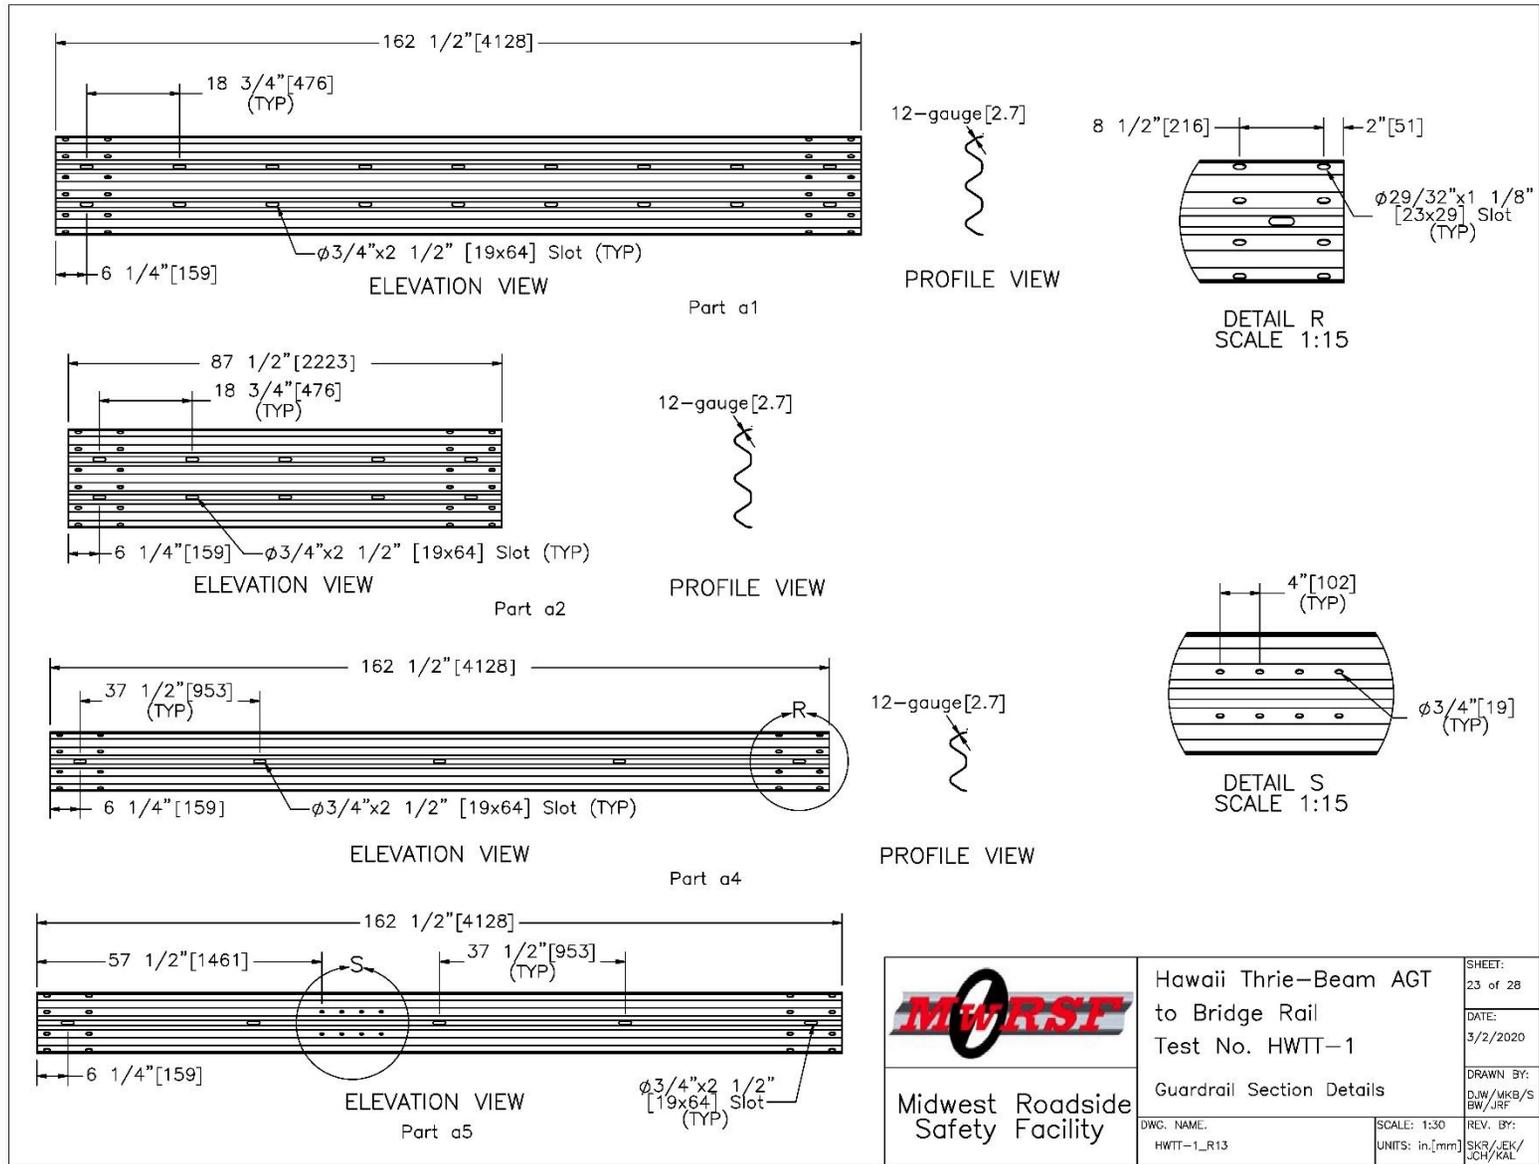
Guardrail Section Details, Test Nos. HWTT-1 and HWTT-2
